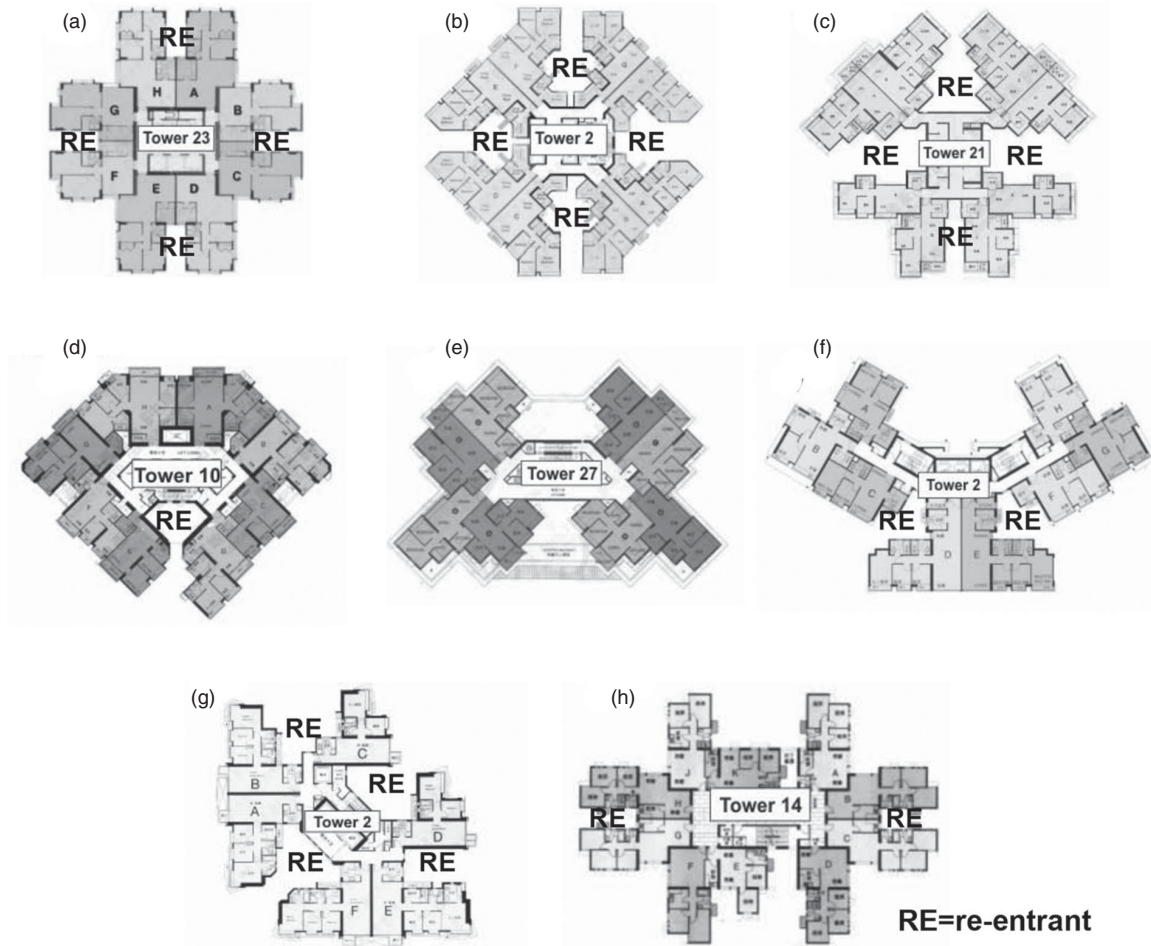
Typical floor plan of private housing in Hong Kong: (a) cruciform, (b) pinwheel, (c) hybrid, (d) diamond, (e) X-shaped, (f) Y-shaped, (g) 6-unit, and (h) 10-unit plan.
